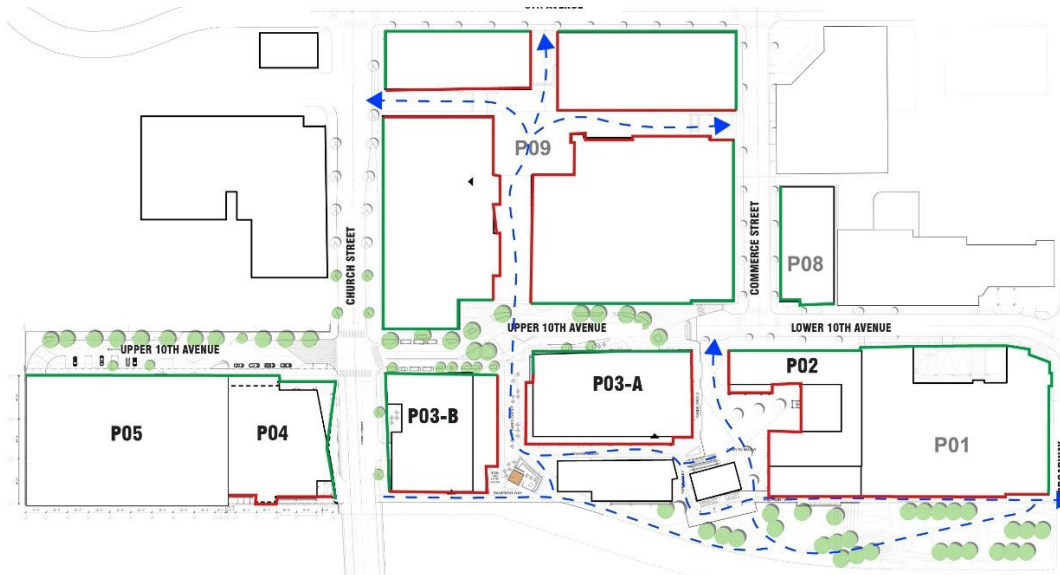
Street Facing and Non-Street Facing Activated Facades with Pedestrian Paths
